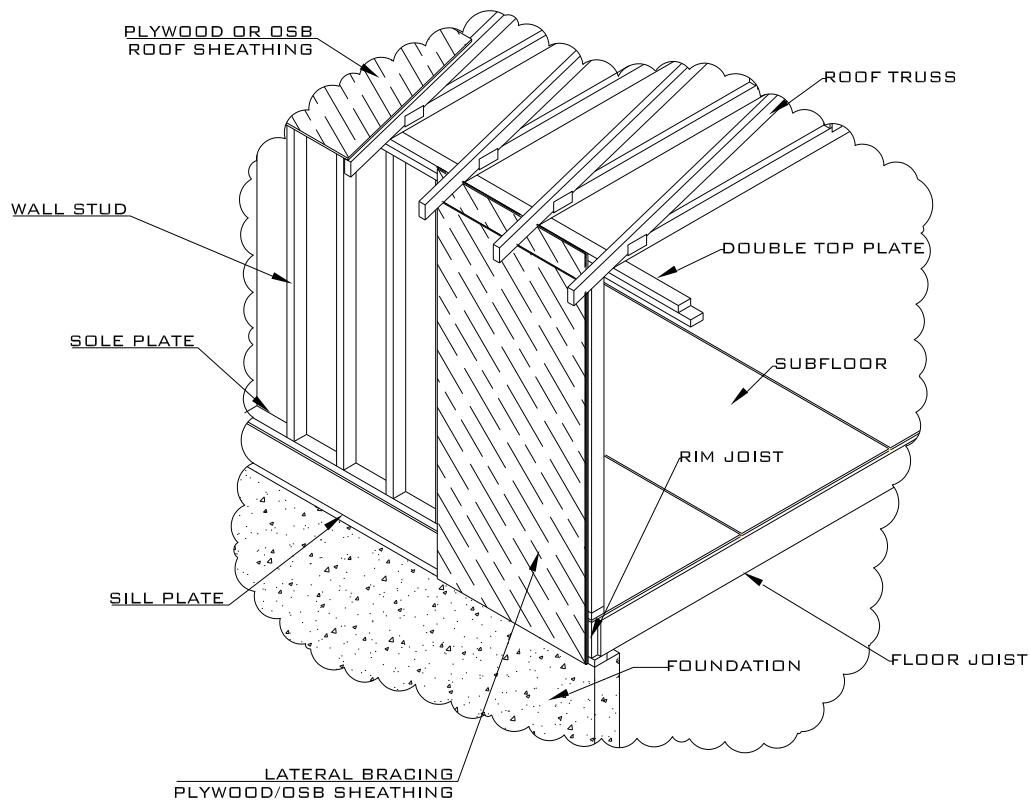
DIAGRAM OF RESIDENTIAL FRAMING SHOWING SHEATHING PANEL AS LATERAL BRACING
